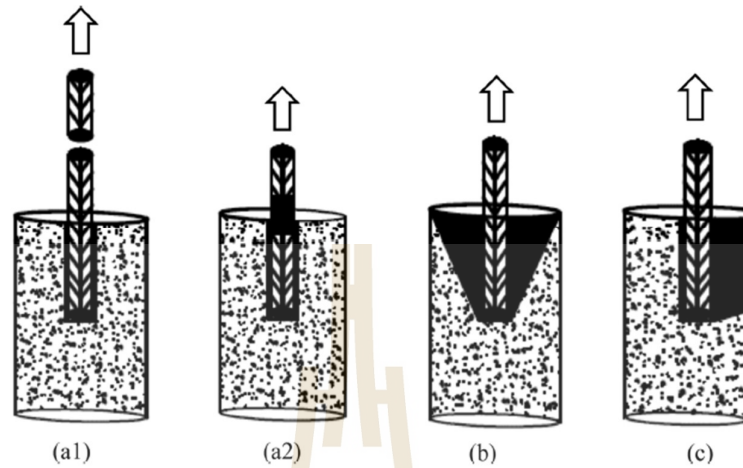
Failure modes of pull-out test in concrete under tensile loading; (a1) and (a2) rebar rupture and rebar yielding, respectively; (b) v-notch failure of concrete; (c) concrete cracking or rupture failure. (Ahmed et al. (Ahmed, Shahjalal, Siddique and Keng, 2021))
